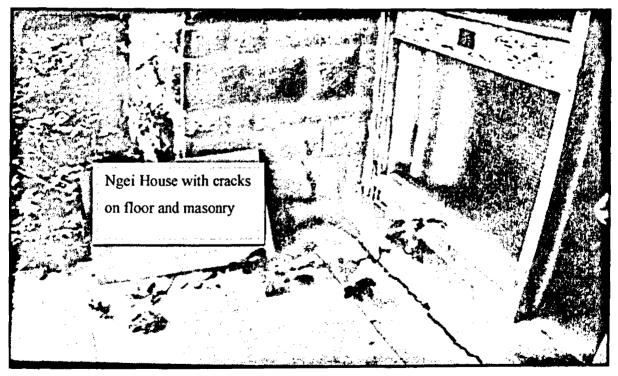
Distressed house with cracks in the floor and masonry (1979 file photo courtesy of MR&PW)
